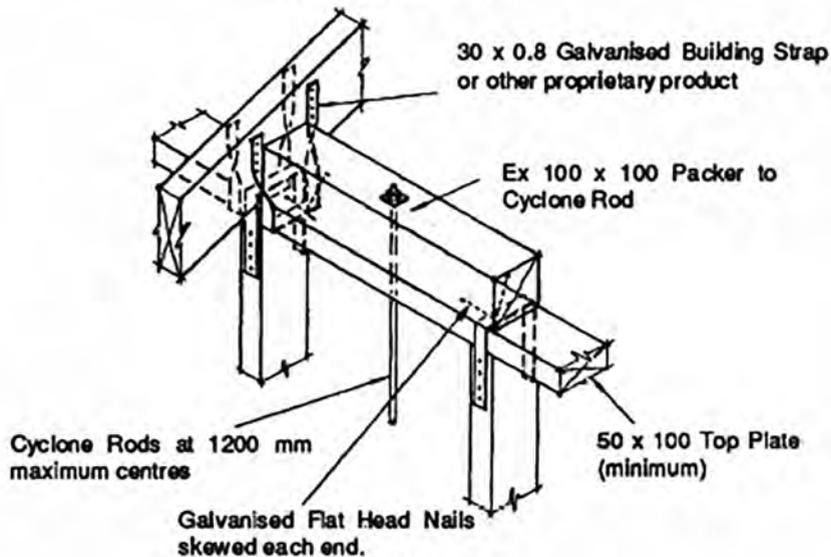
FIXING OF GABLE END WALLS TO SIDE WALLS AT TOP PLATE LEVEL
